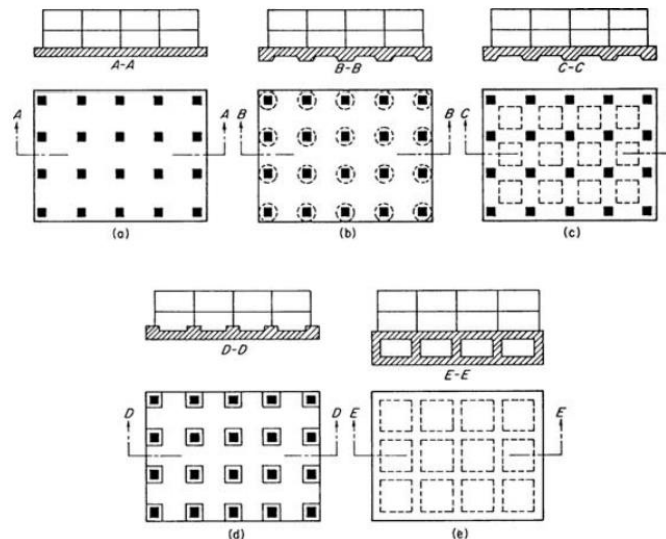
Some types of mat foundations: a) flat plate; b) plate thickened under columns; c) beam-and-slab; d) plate with pedestals; e) basement walls as part of mat
